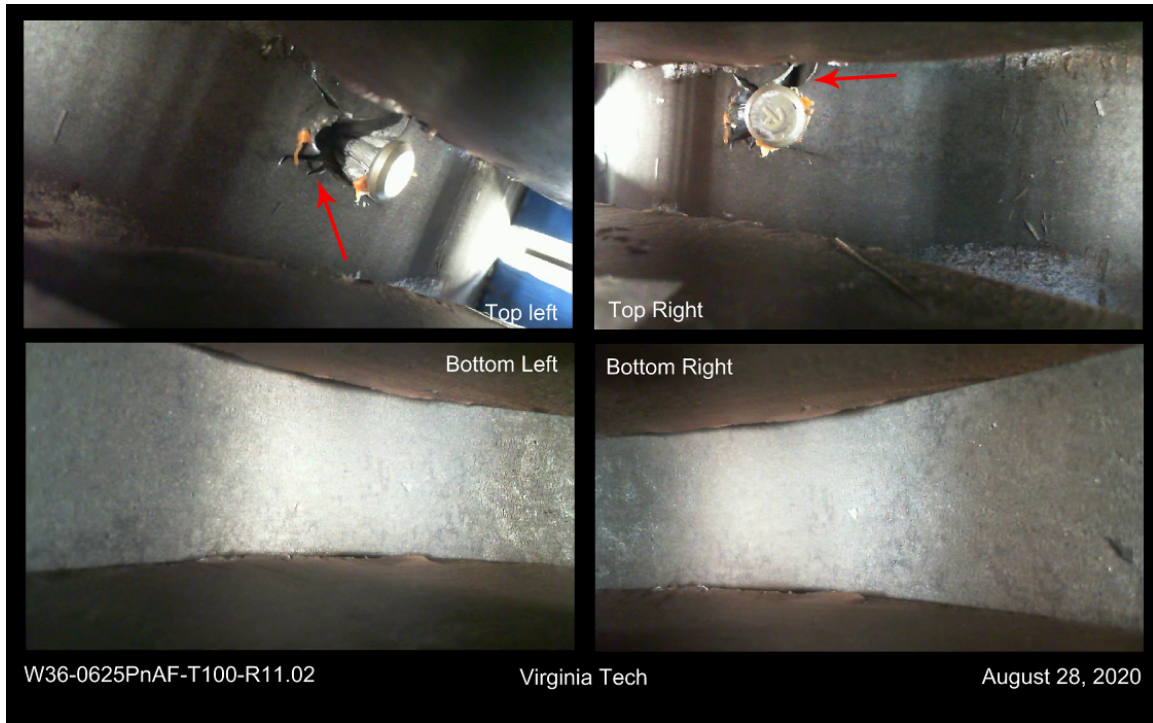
Fracture surfaces of W36-0.625PnAF-T100-R11.01.
